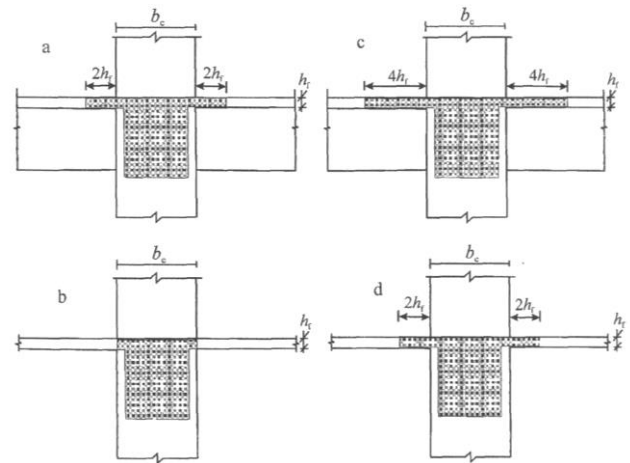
Effective flange width b_{eff} for beams framing into columns
